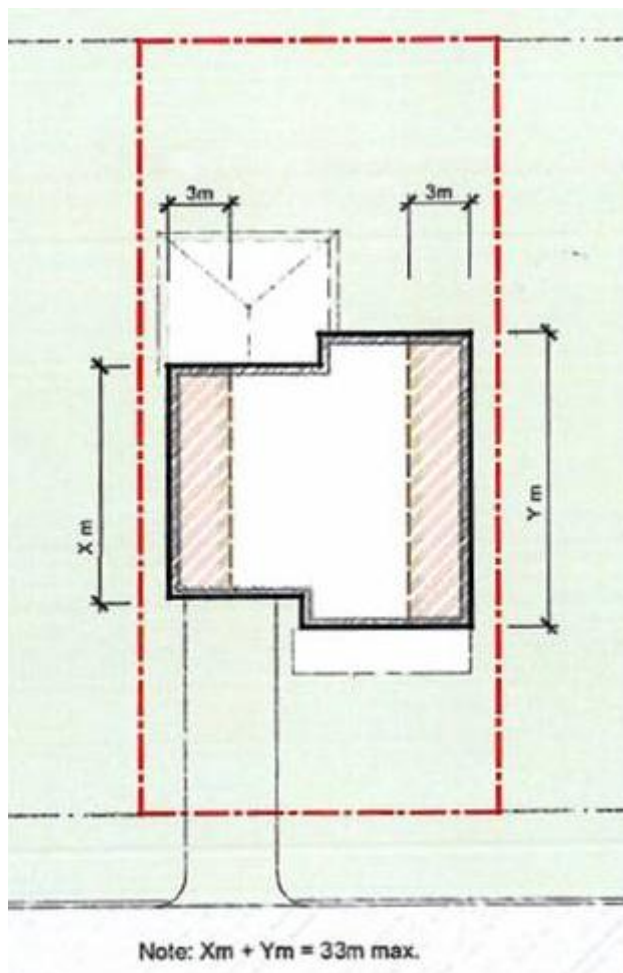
Maximum Total First Floor Wall Length of a Two Storey Dwelling
